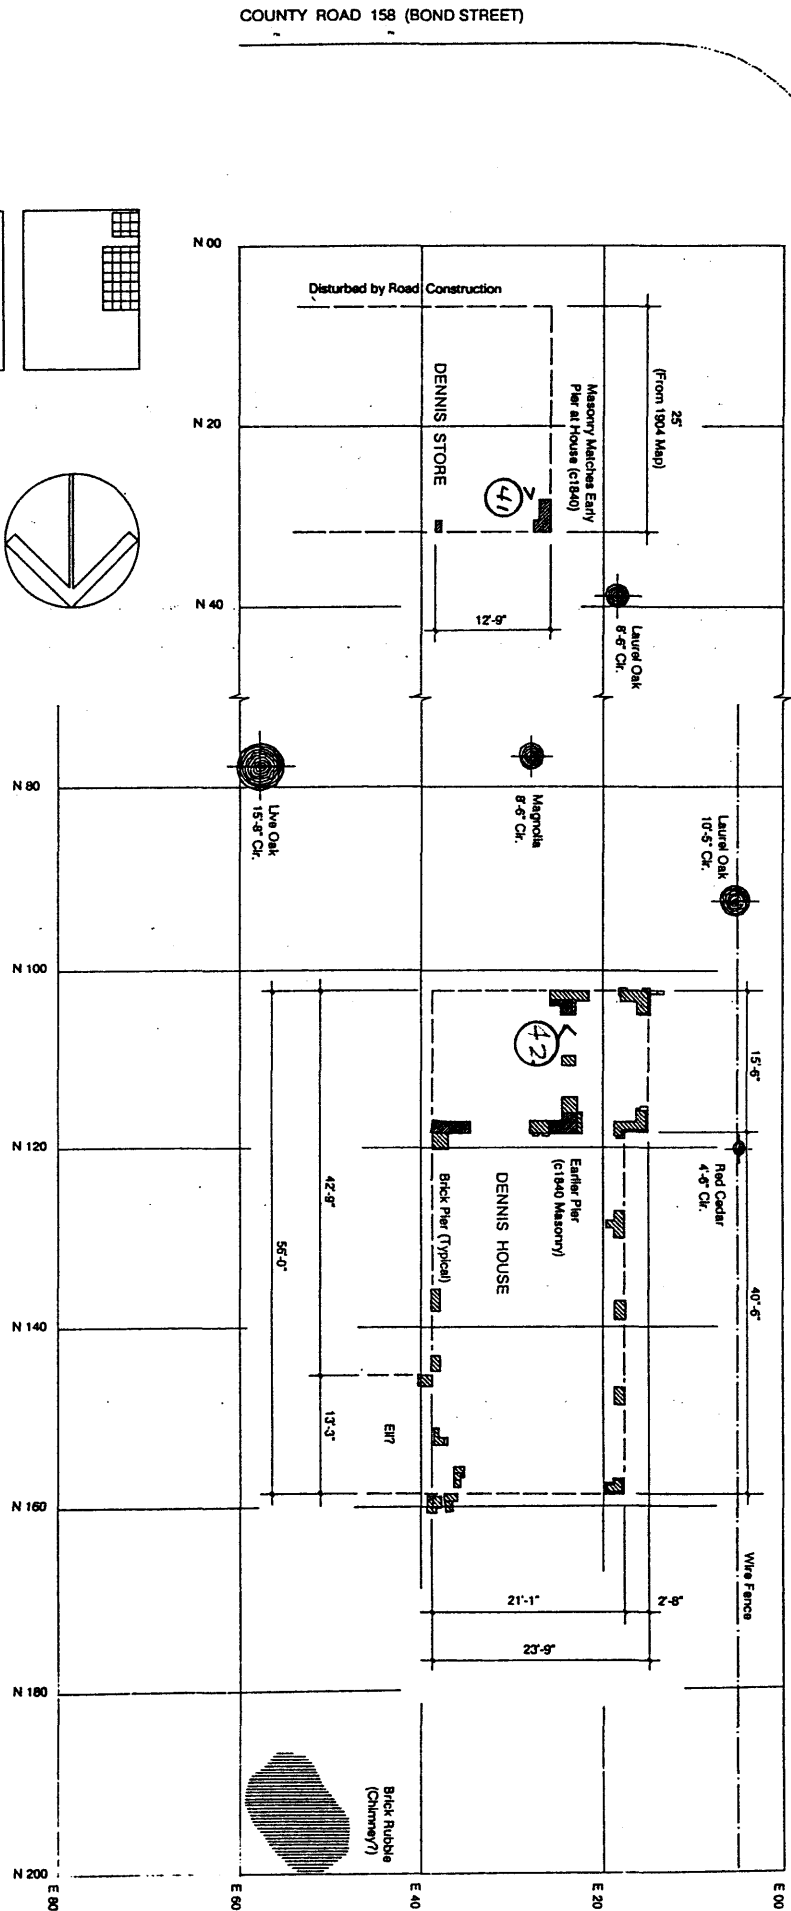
SCHEMATIC PLAN - DENNIS HOUSE AND STORE
